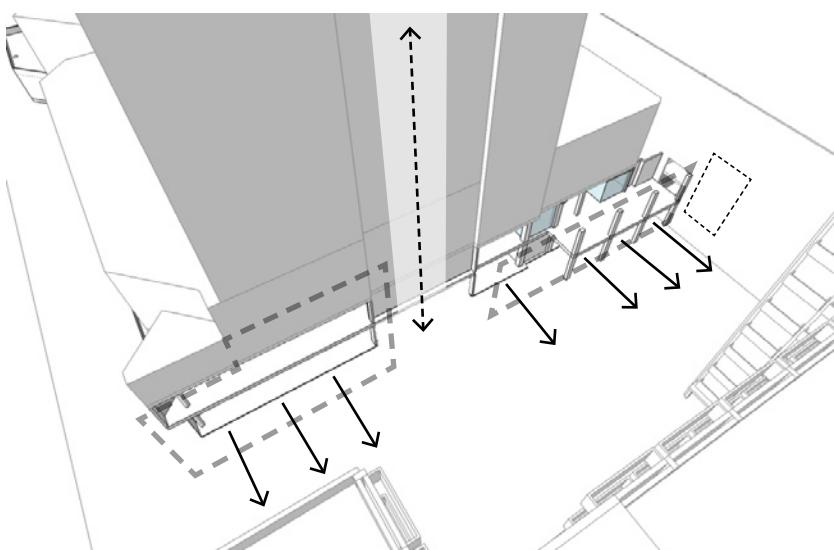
Demolish the outer layer of Momentum facade, leaving volumes exposed. Store rubble on site. Utilise existing elevator shaft to provide future vertical circulation.
